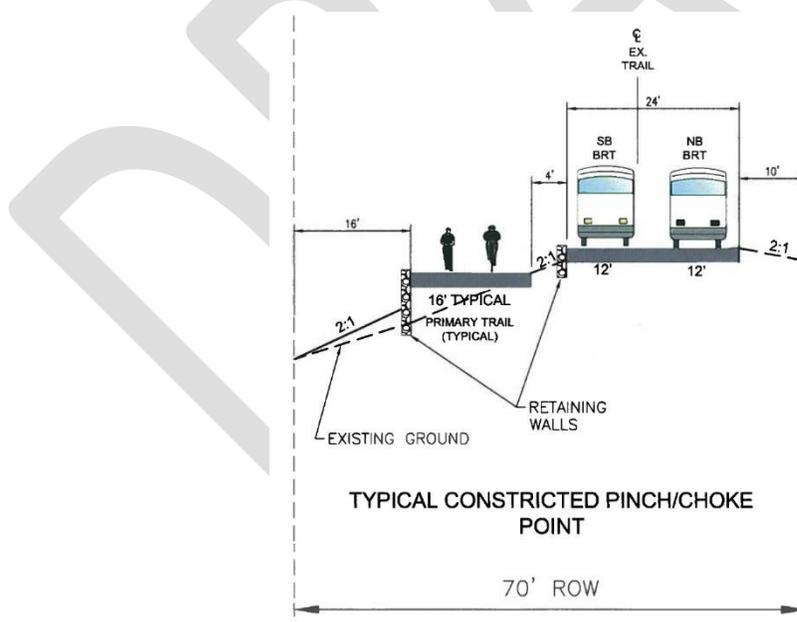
Typical constricted pinch/choke point for 116th Avenue NE to NE 120th Street segment
